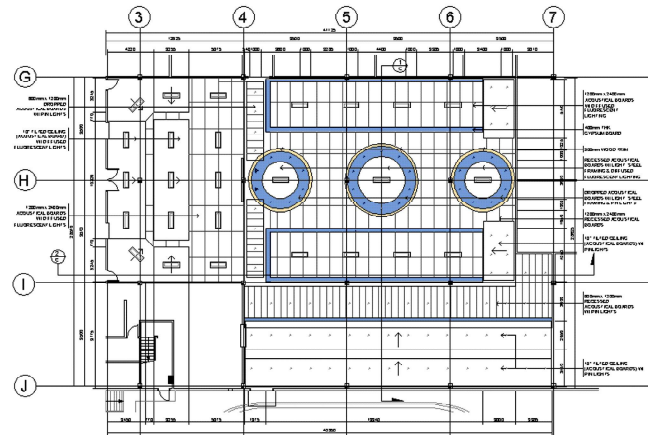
Proposed reflected ceiling plan of Intel CV1 cafeteria
